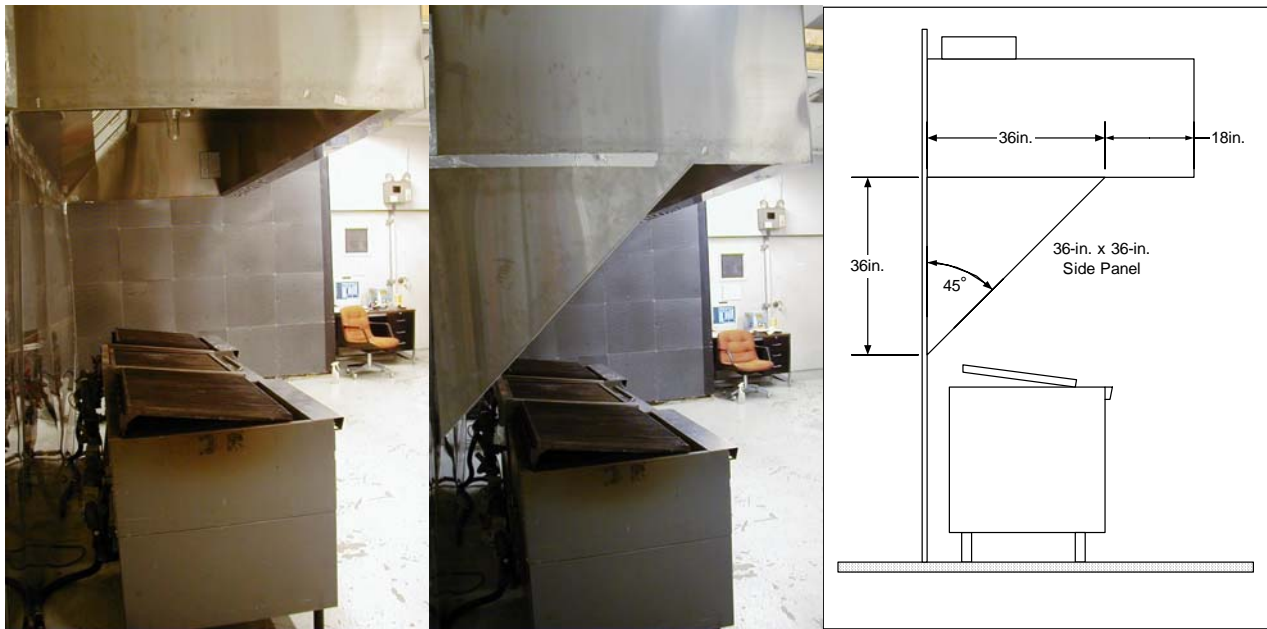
Side View with and without 36-inch x 36-inch Side Panels
